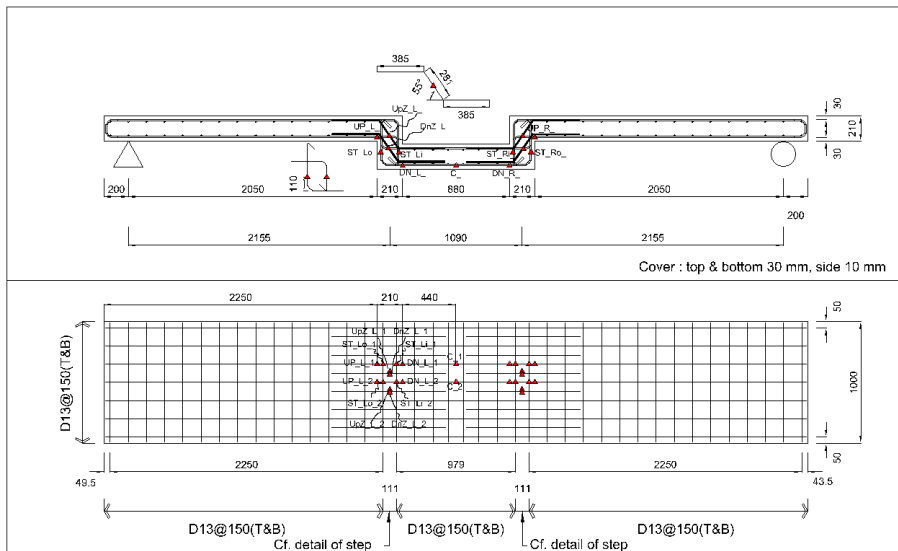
Drawing of specimen-6 image and the gauge location (mm)
